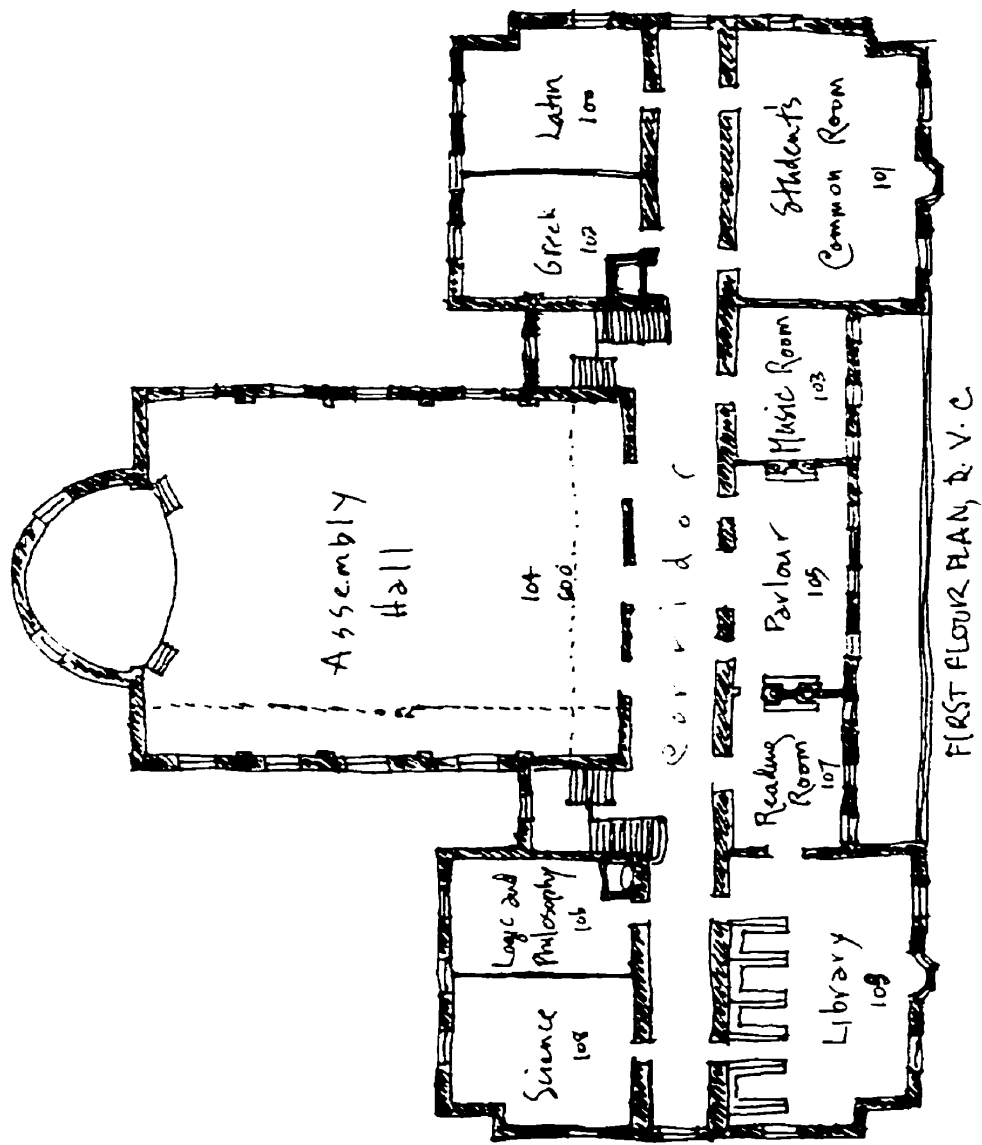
Ground floor plan RVC. Source: Author, based on Price's own plans.
